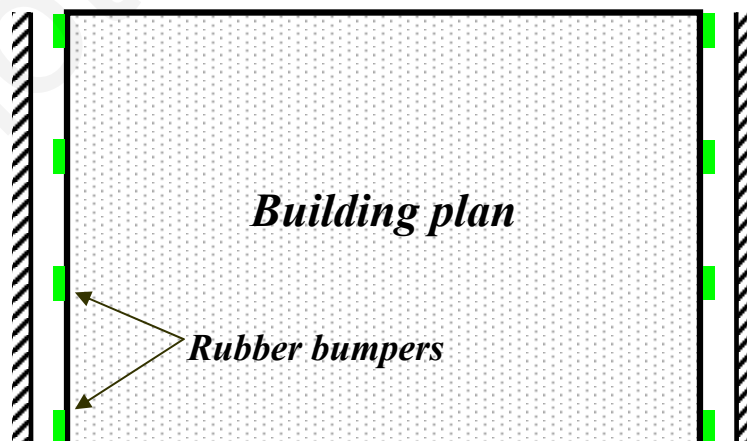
Locations of rubber shock-absorbers in a plan view of the building.
